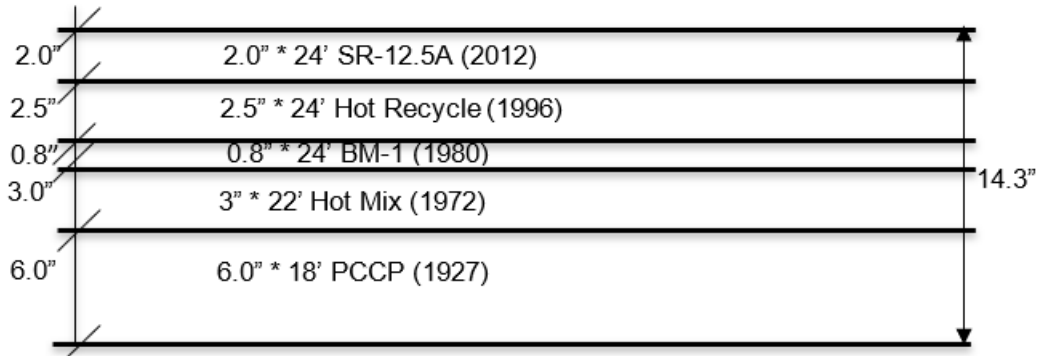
Historical Record of Pavement Layers in Shawnee1, Segment Two
